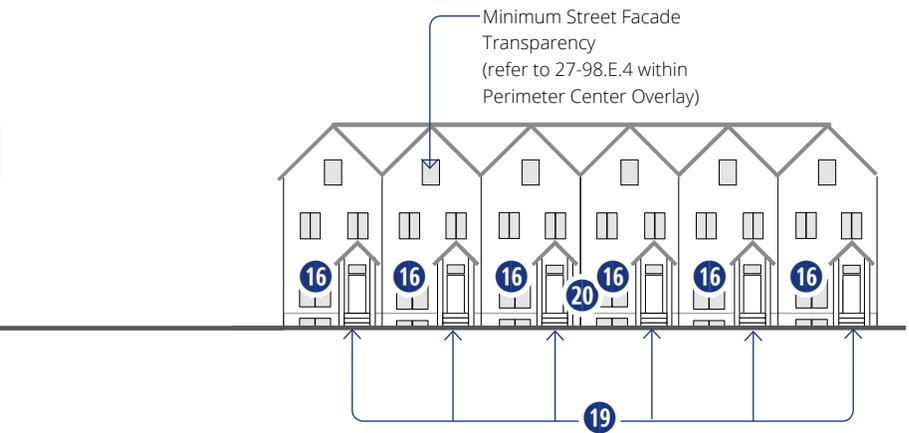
Townhouse Building: Street Facade Design Requirements
